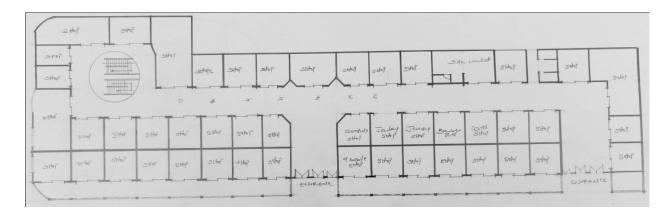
GROUND FLOOR PLAN OF CASE STUDY ONE
